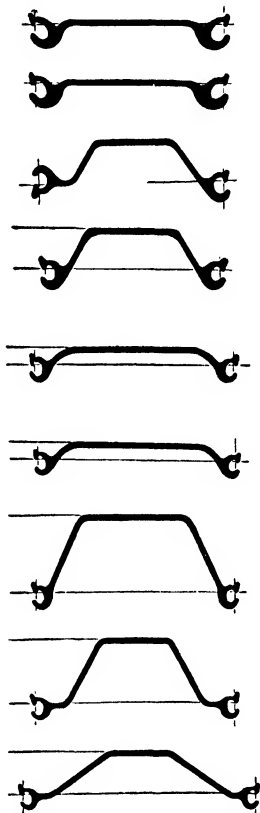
Newer Forms of Steel Sheet Piling.
